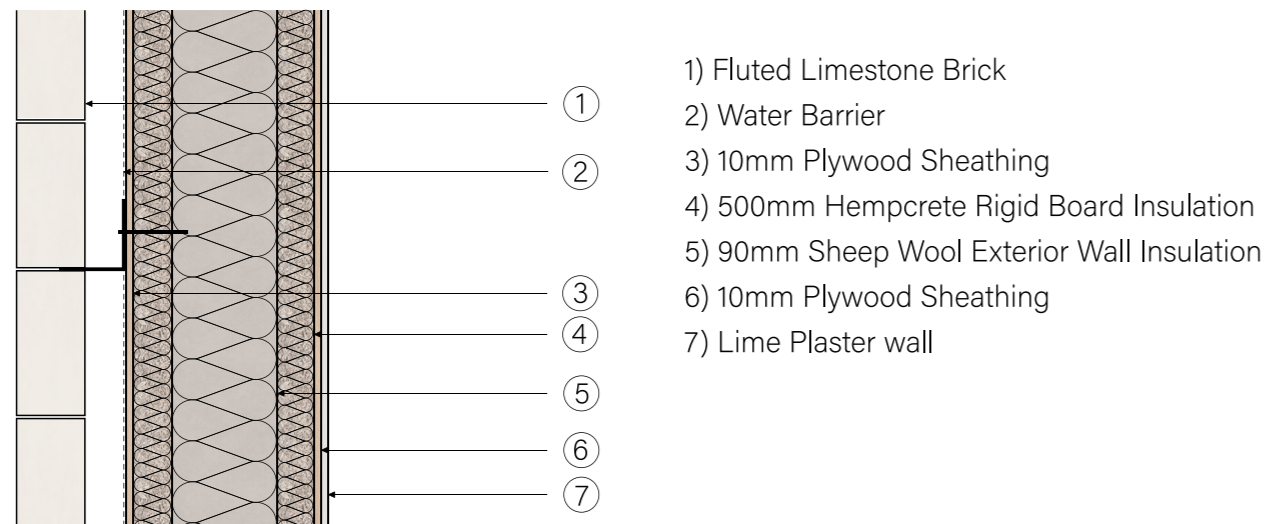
Limestone Wall Detail Drawing (Scale 1:200)
